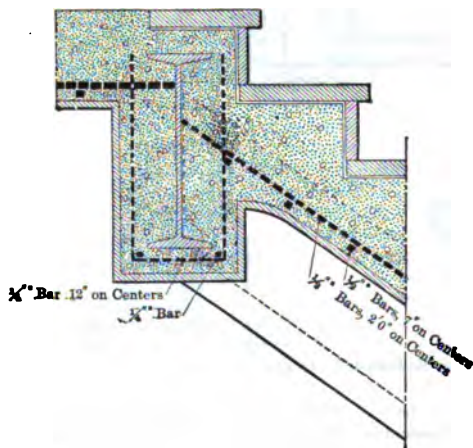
Reinforced-concrete Stairs, Government Printing Office, Washington, D. C.
